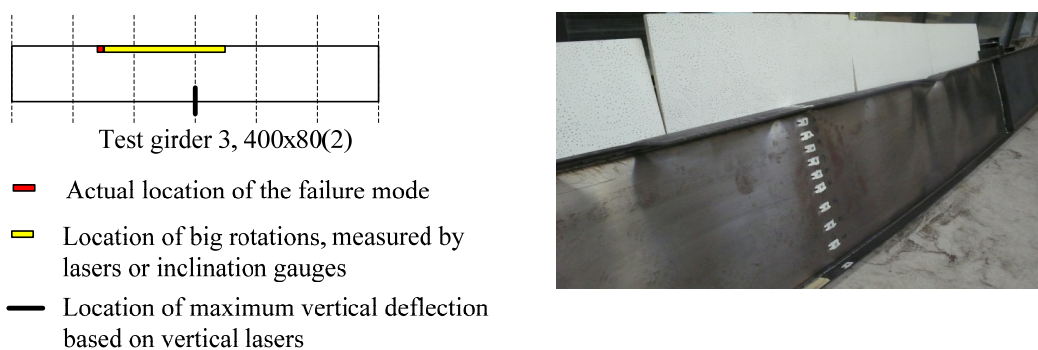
Location of the final failure mode of test girder 3, 400x80(2)
